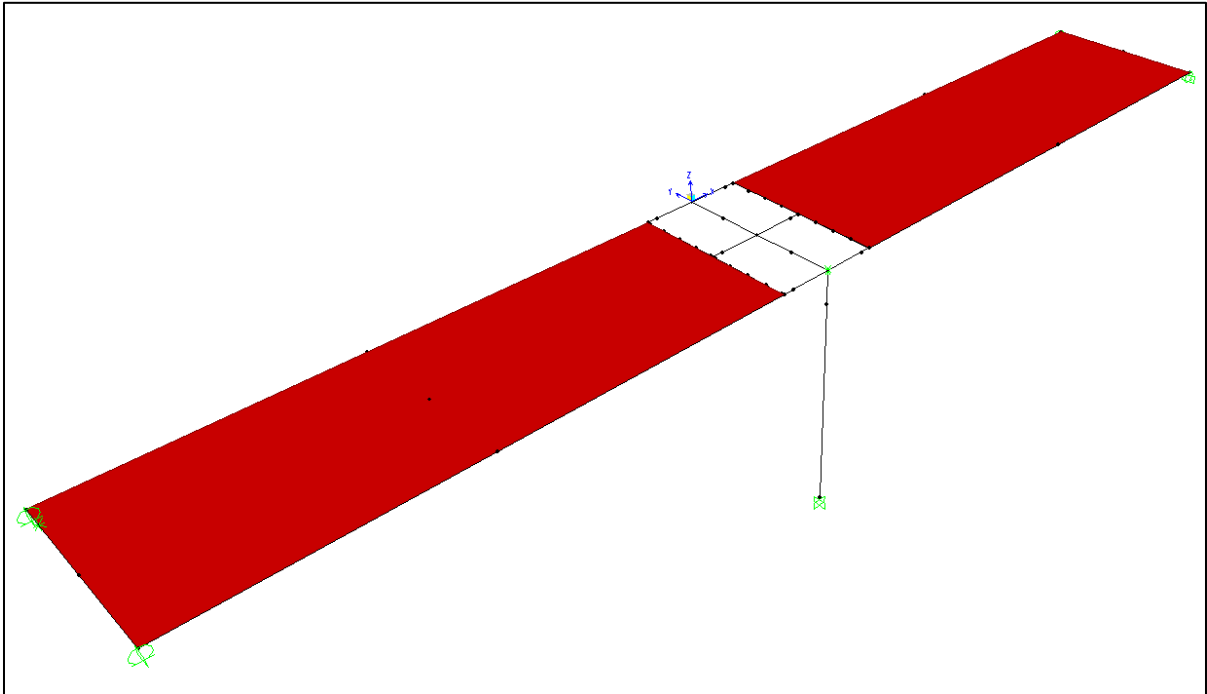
Grillage Model After Adding the Deck Area Elements
